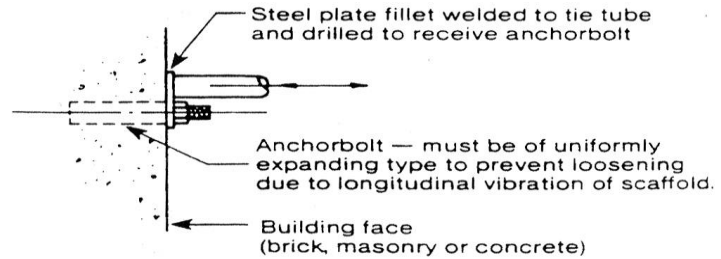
Anchor bolt tie. Vertical or horizontal section through wall where no openings or members are available for tying to.
